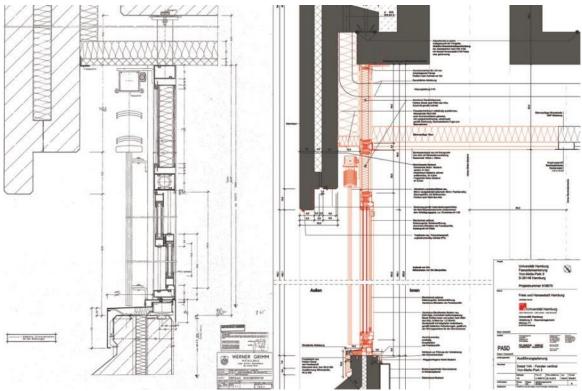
Vertical window section, built situation and refurbishment. Werkplanung 1971: Werner Grimm Metallbau Eutin. Ausschnitt Werkplanung 2016: PASD Architekten. Feldmeier 🛙 Wrede
